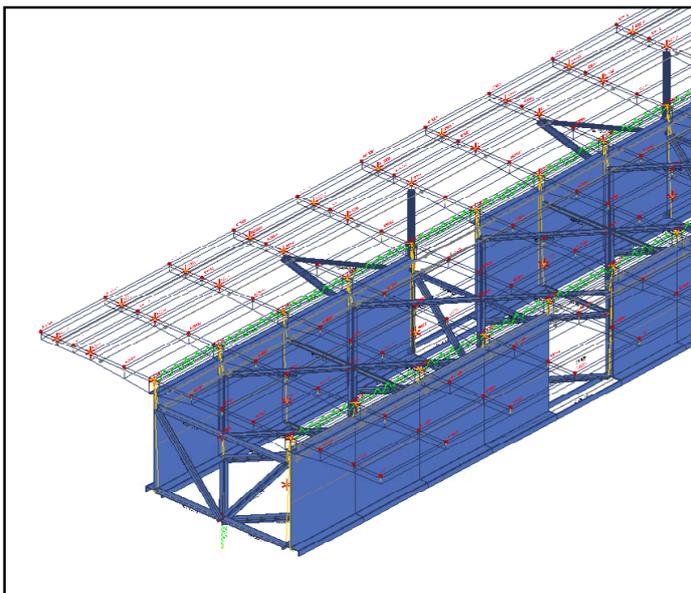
Typical hybrid model of the bridge with beam steel members and “virtual” beam slab implemented as substructure with shell elements
